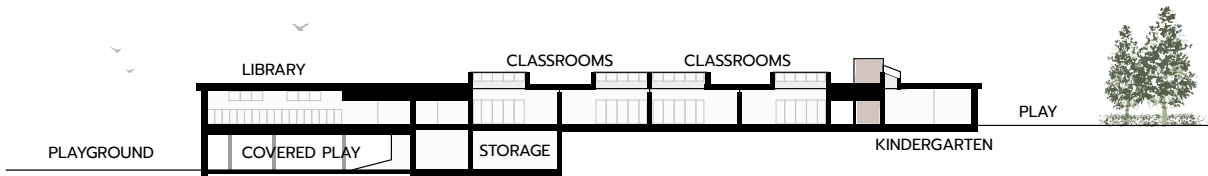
section of wilkes school. (Mahlum Architects, 2020)
